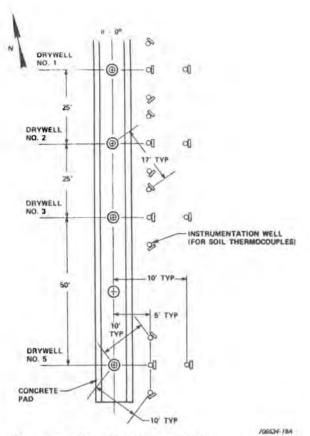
Drywell and Soil Instrumentation Well Arrangement
